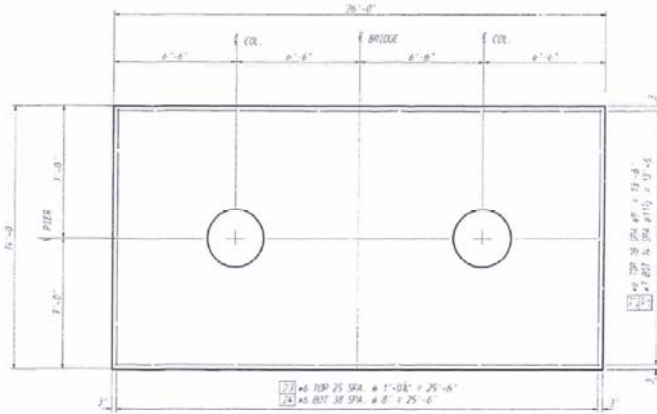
Bridge Foundation Spread Footing for Bents
